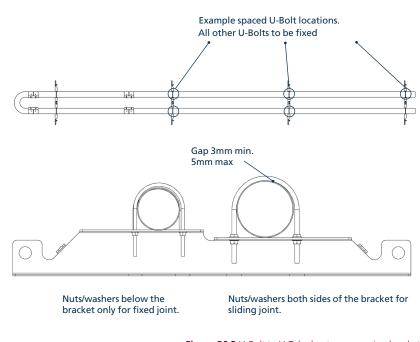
U-Bolt to U-Tube heater suspension brackets
